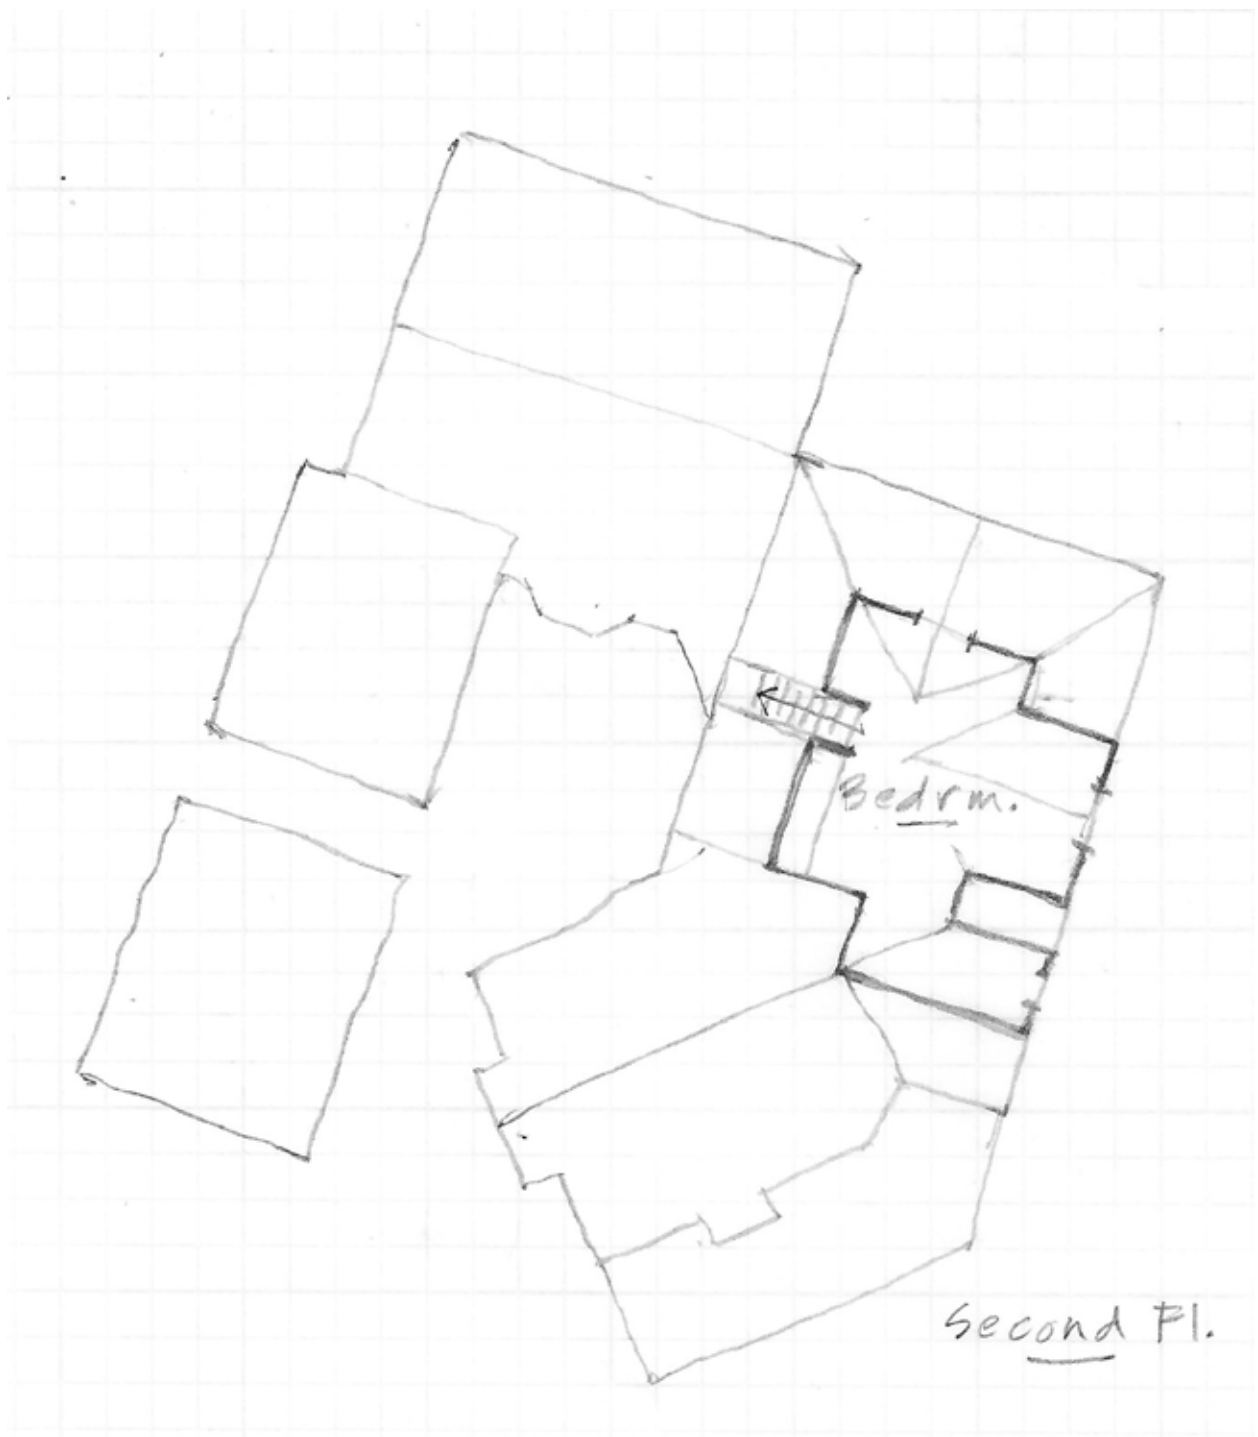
1850 Alameda Diablo – Second floor plan (south is up)
